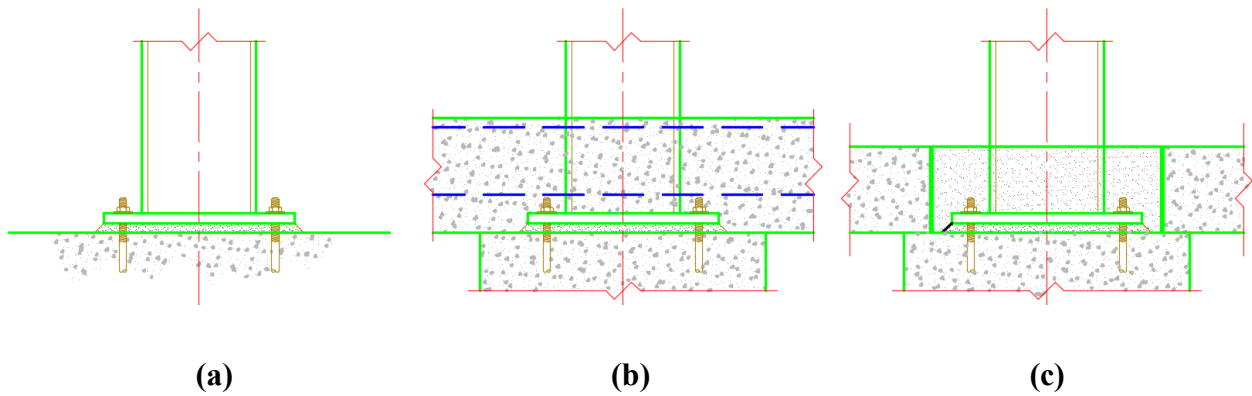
Typical Details for (a) Exposed Column Base Plate, (b) Embedded Column Base Plate, and (c) Shallowly Embedded Column Base Plate
